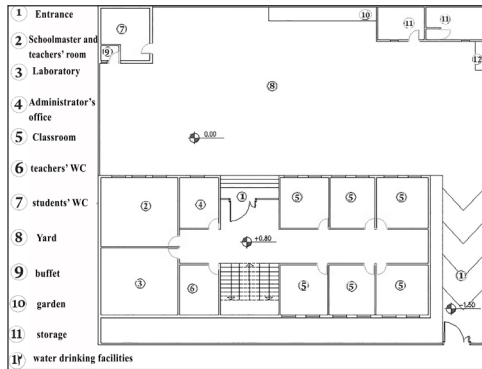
The Plan of the Ground Floor in Shahid Beheshti Primary School
